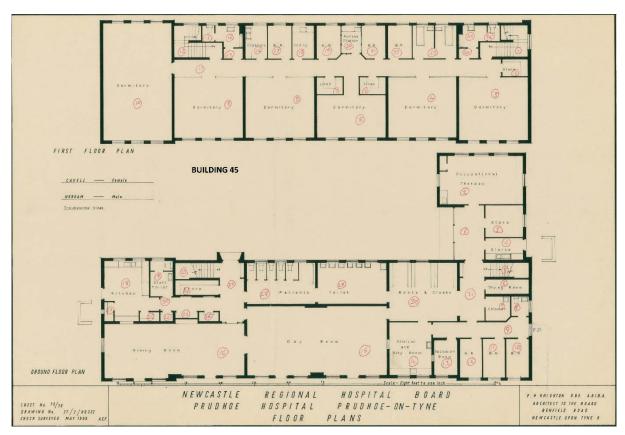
Building 45, Cavell 14, Norham, historic ground plan
